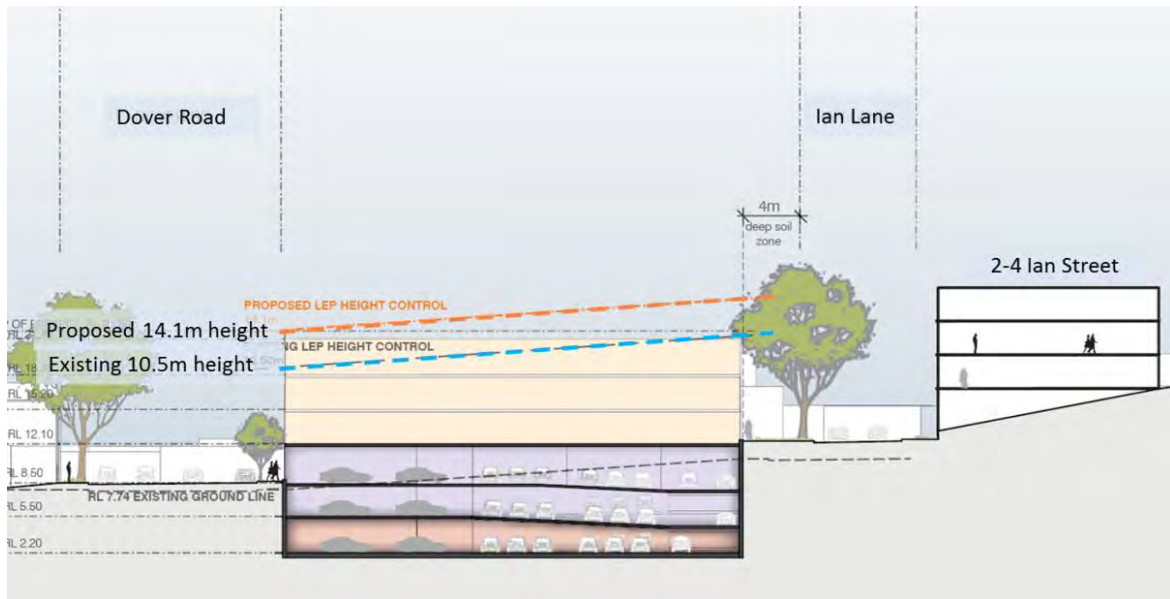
Section of maximum building heights between Dover Road and Ian Lane
